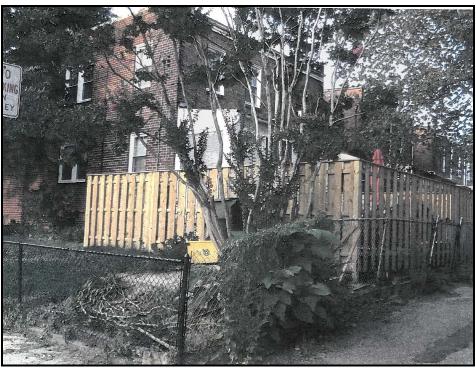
Existing Rear Yard – Proposed 6' high Board-on-Board Fence
